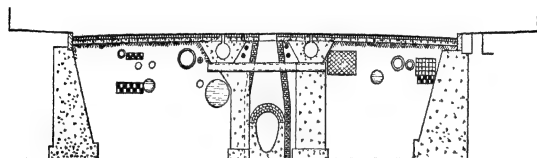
A typical section showing the sub-surface structures in Broadway, New York.
